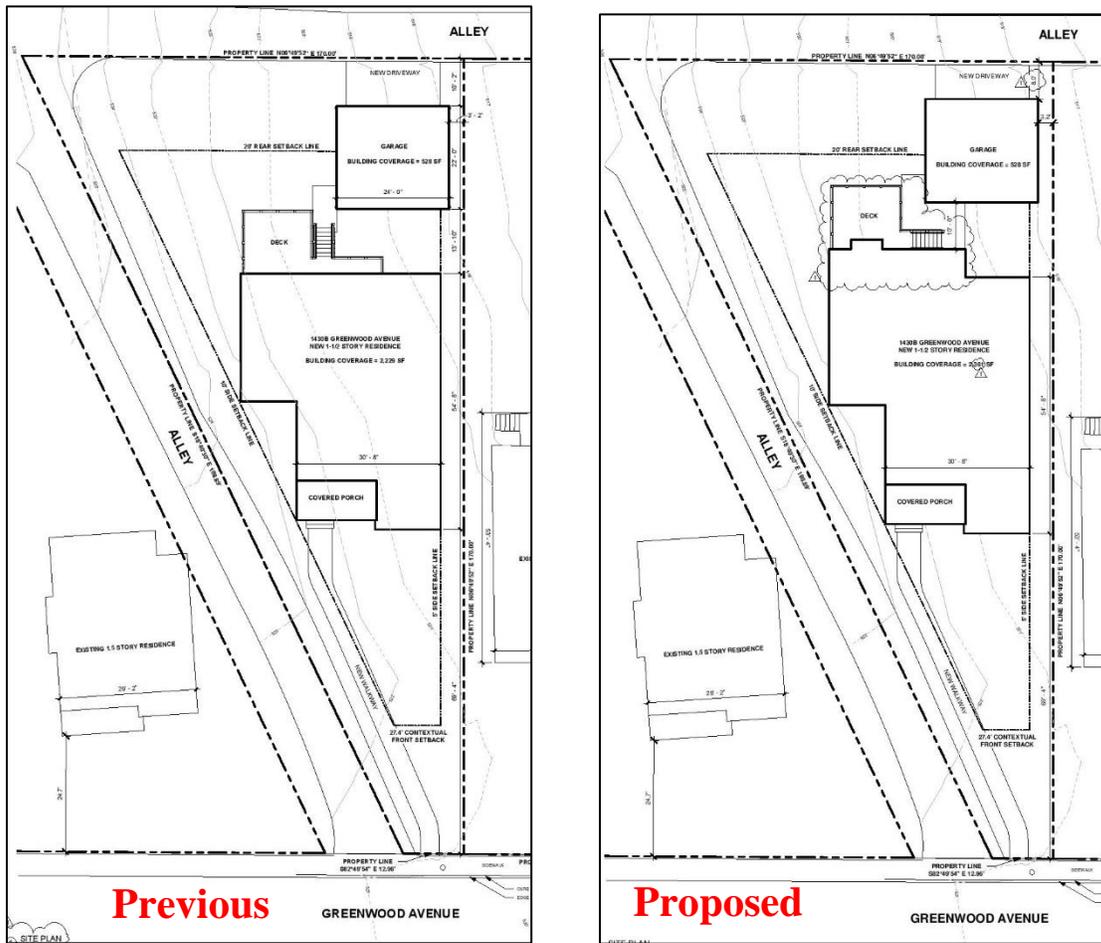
(left) shows the previously approved site plan and Figure 3 (right) shows the proposed site plan.
